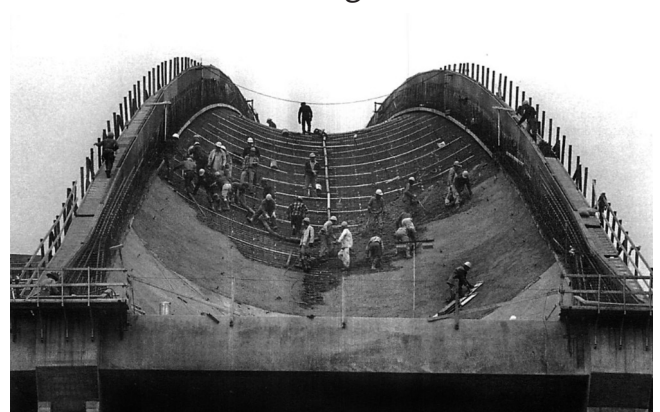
Concrete placement in Shell Roof (Times, 1975)
